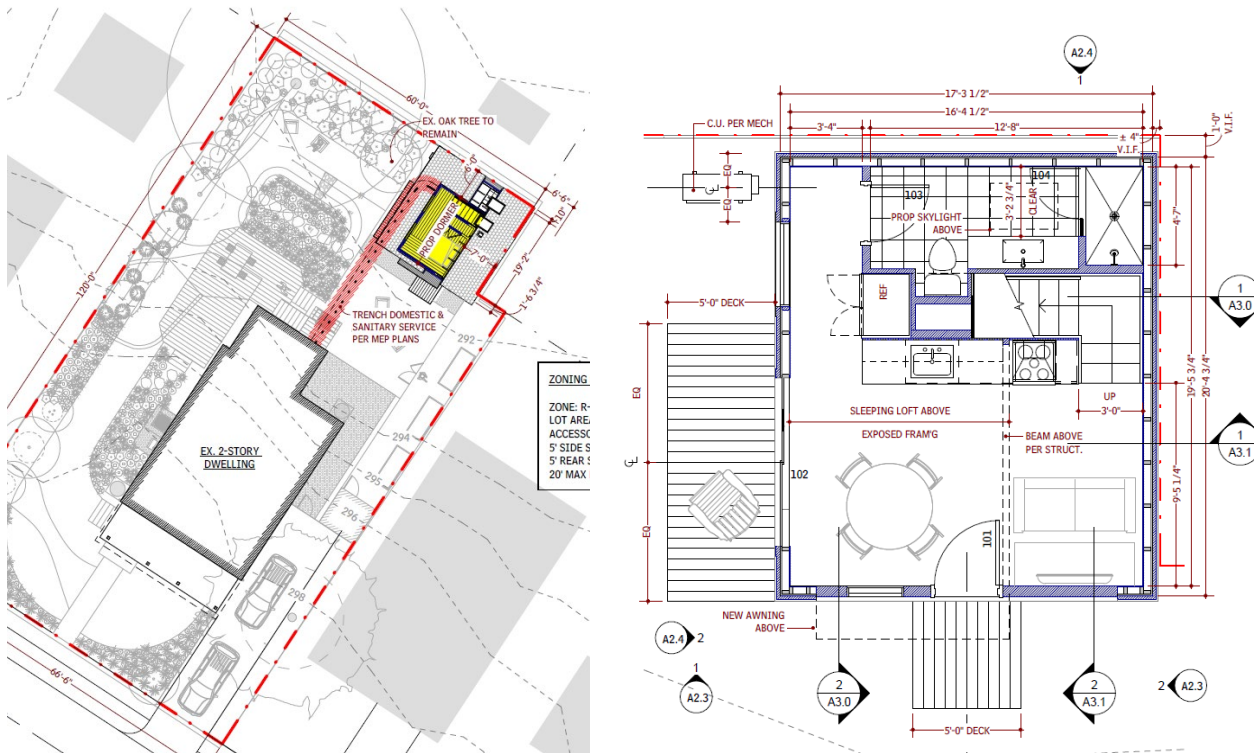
Site plan (left) and floor plan (right) showing location of proposed decking
